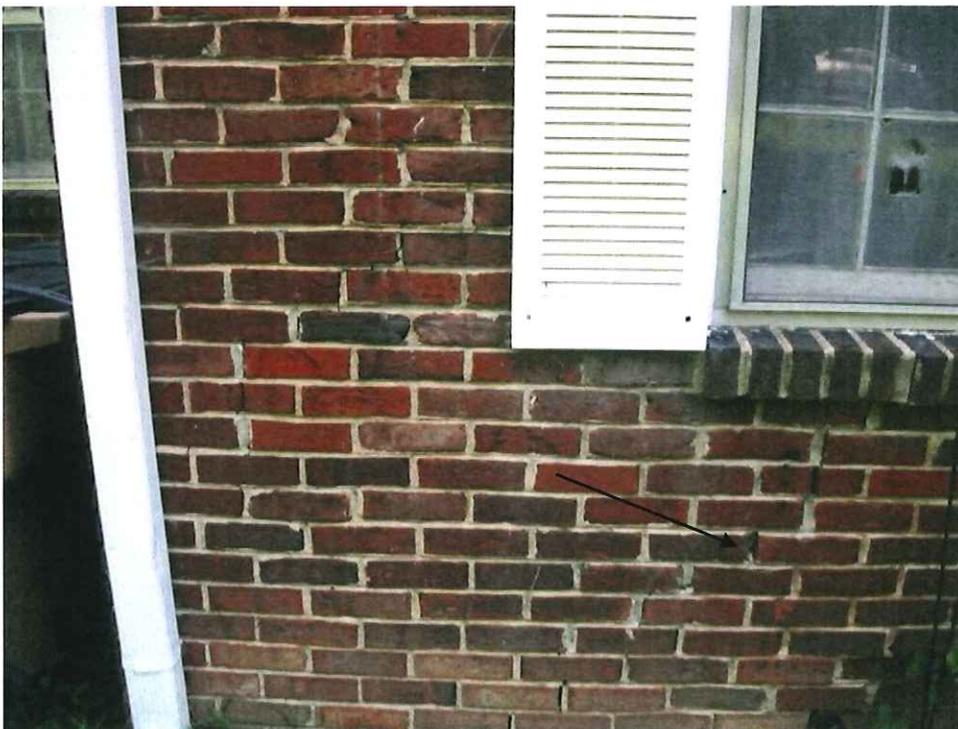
Cracking of brick veneer on front wall beneath window to the left of the front door.
